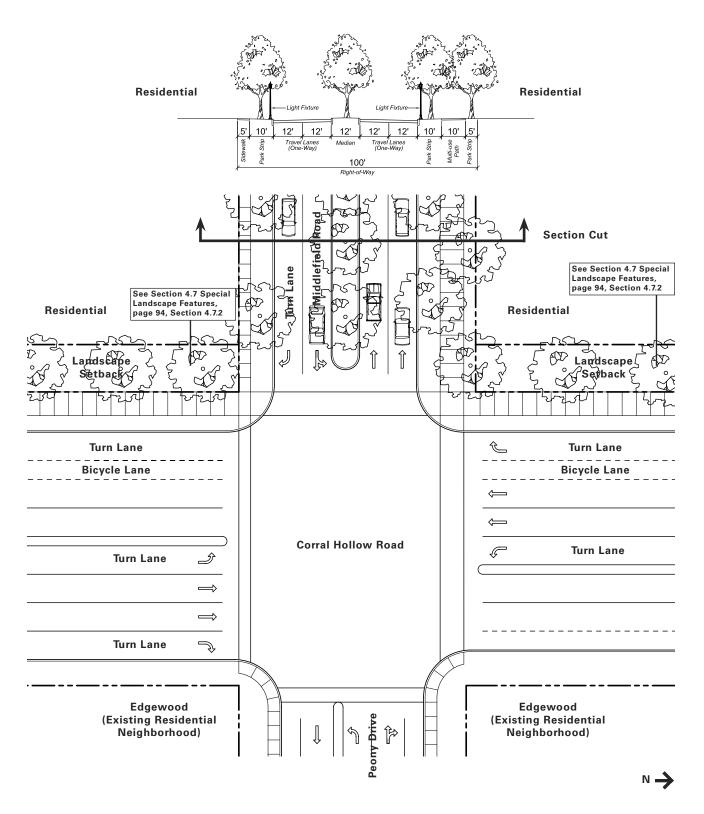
Proposed Section and Plan: Entry Street B
